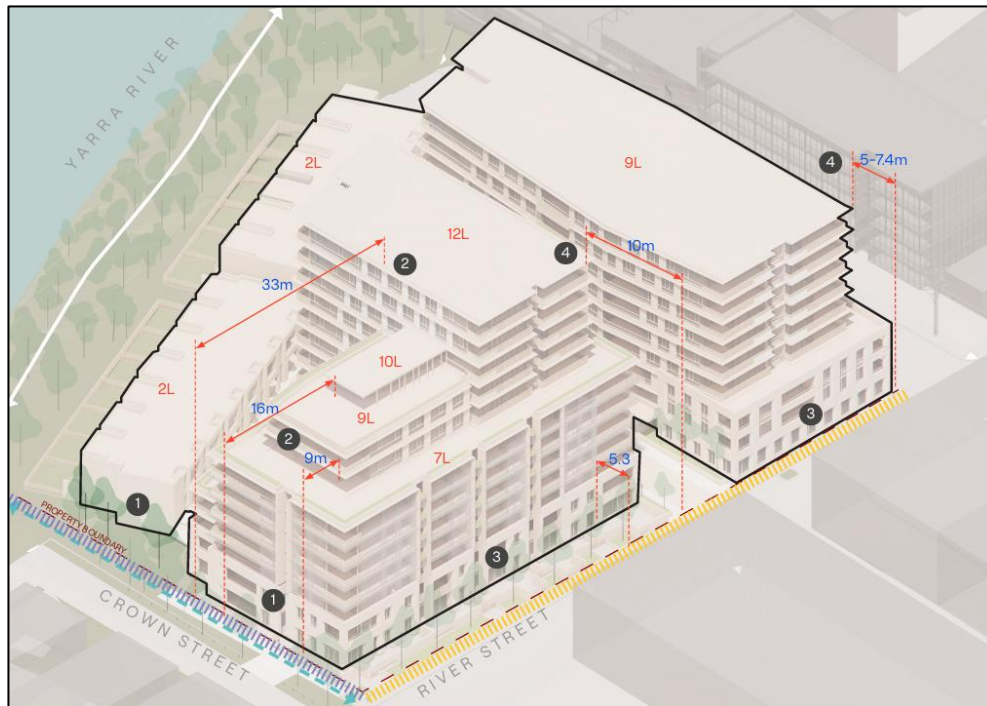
Street wall and setbacks to street frontages (Source: Application)
